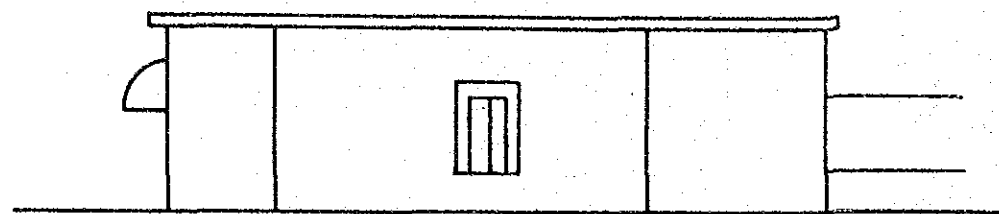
Floor Layout of Savar Transmitting Station
